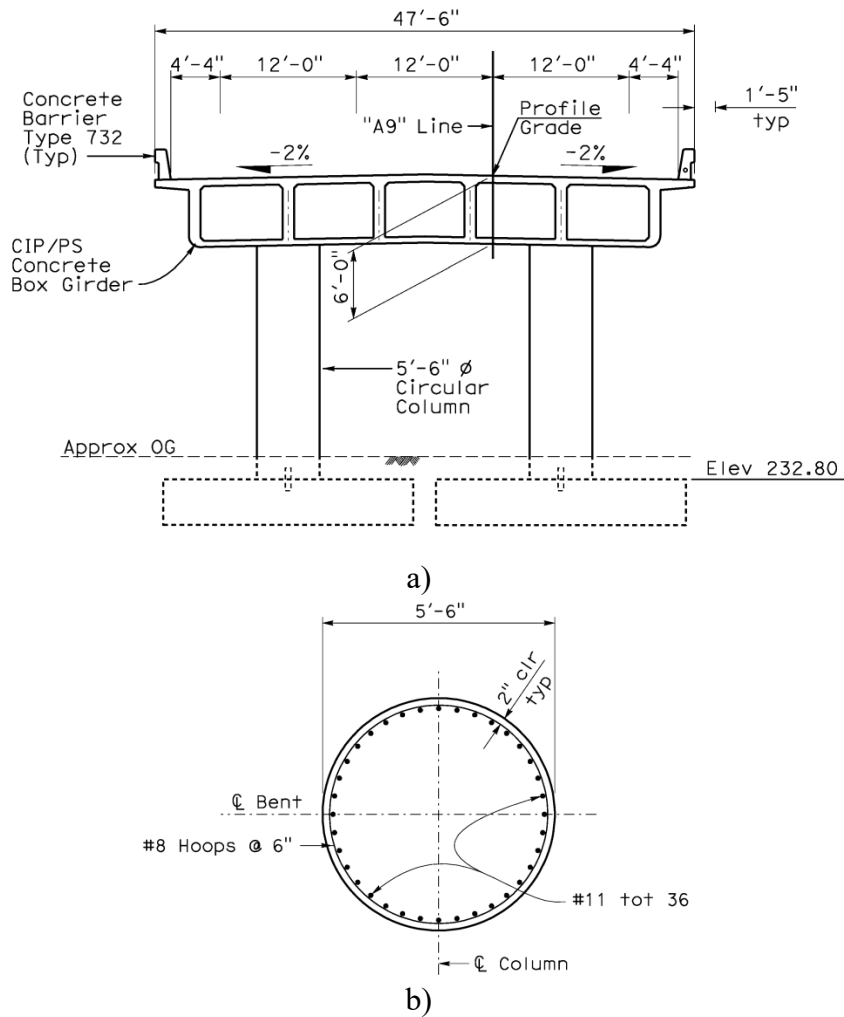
Sectional details of OSB1: (a) deck; (b) circular column cross section (Caltrans 2012)
